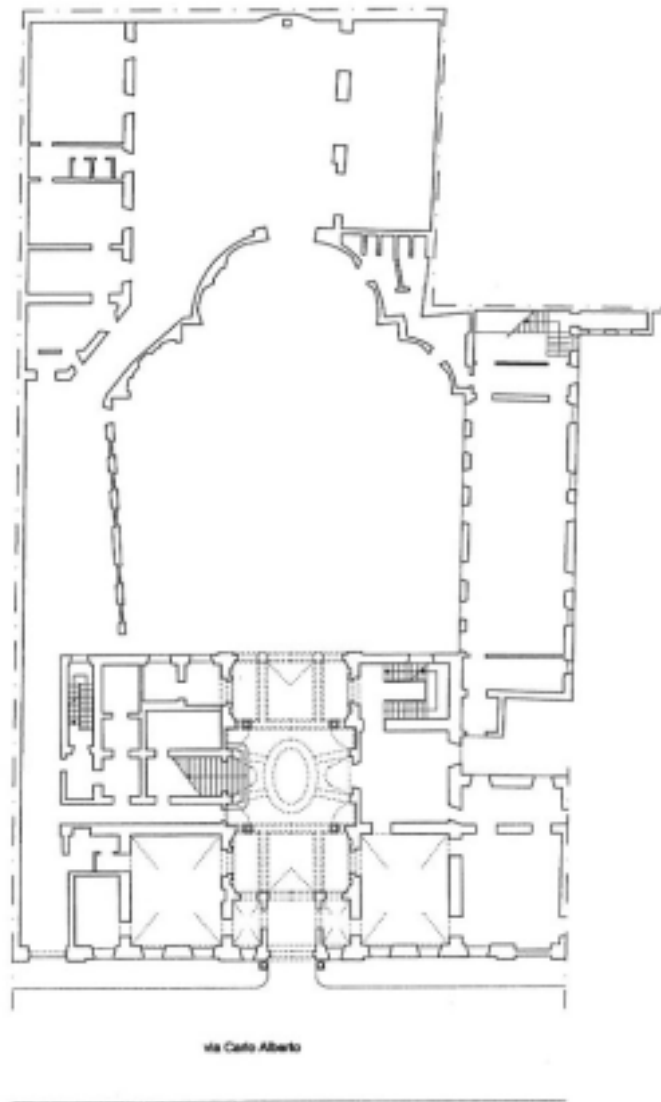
Palazzo Birago di Borgaro. Ground Floor Plan (original scale 1:200)
